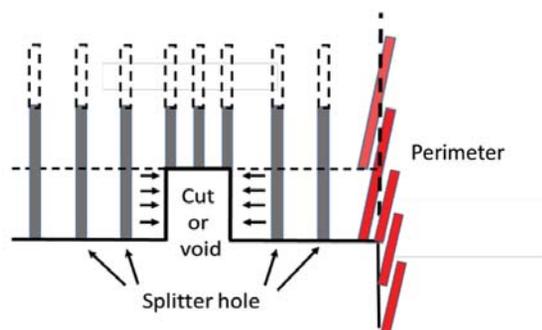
Plan view of splitting rock into newly created void and perimeter holes drilled at an angle
